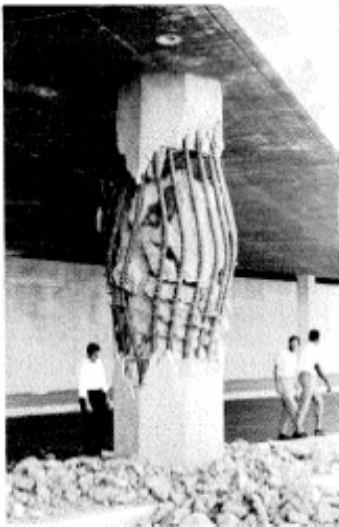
Foothill Freeway Column Failure [2]
